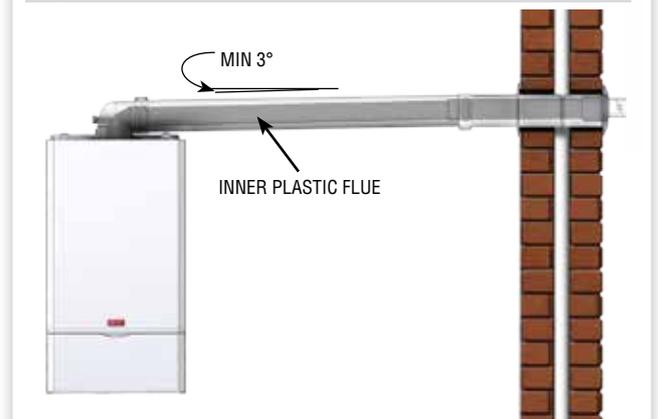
EXTENDED FLUE THROUGH THE WALL
